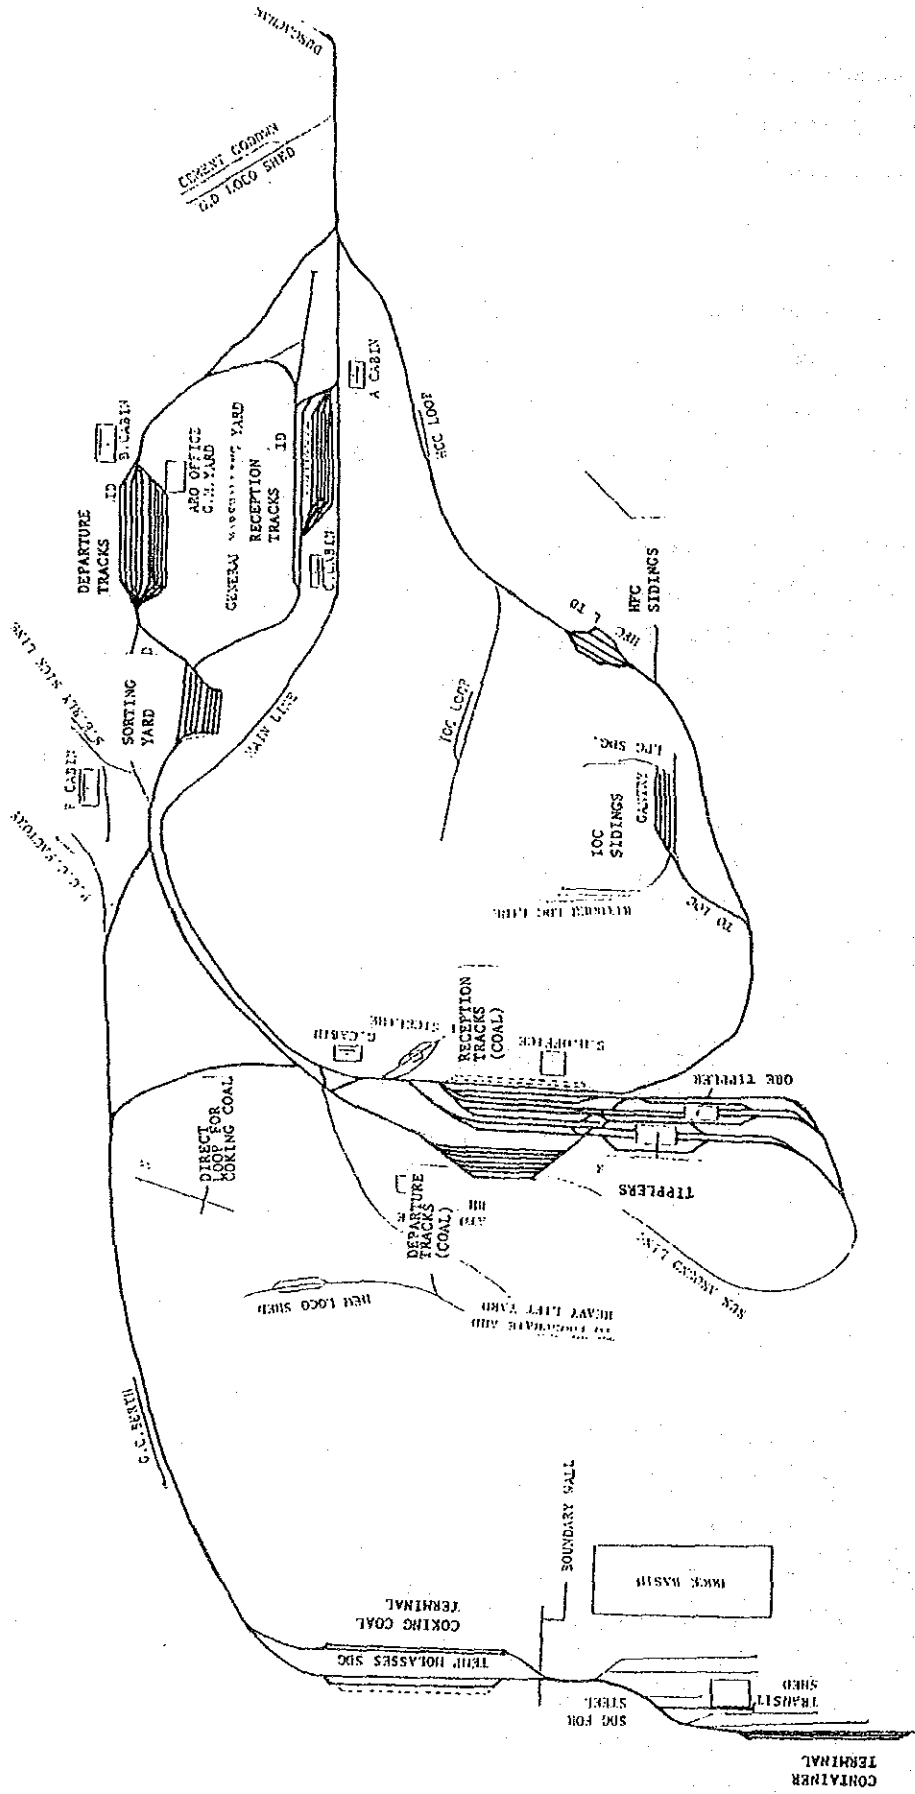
General Plan of Haldia Railway System (1995)
